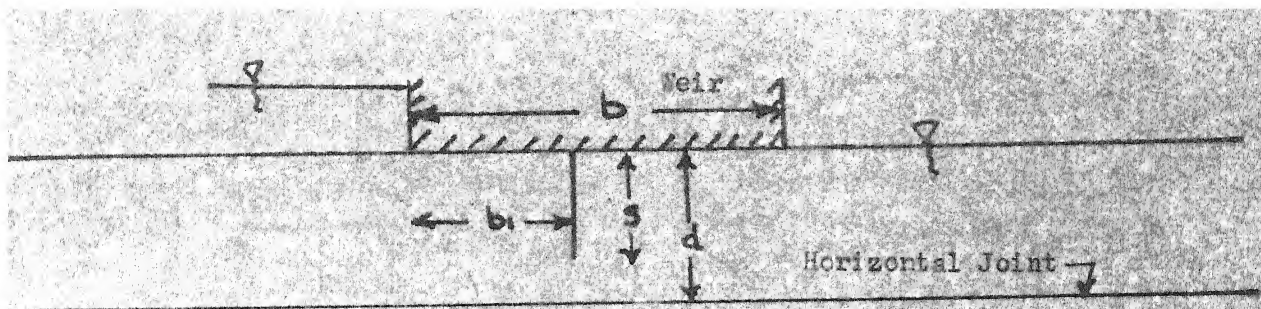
(a) Weir resting on rock foundation with a horizontal joint.
